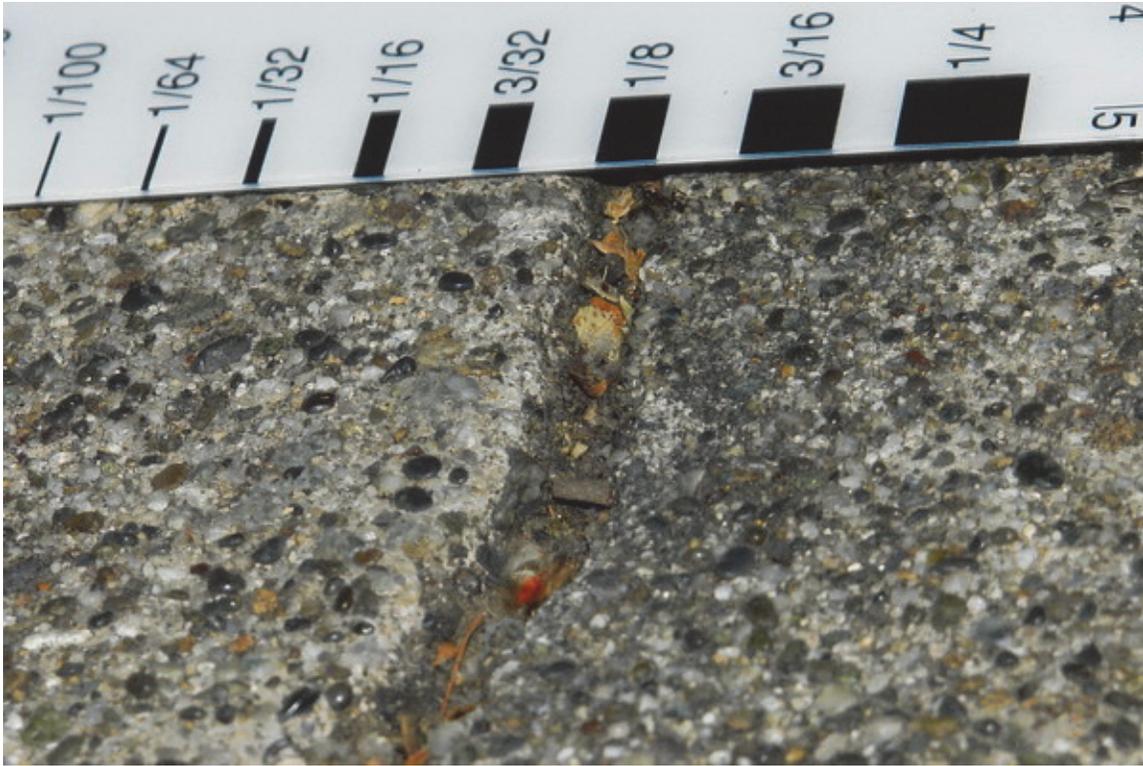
Older crack in concrete exhibiting worn and rounded edges (photo credit: Exponent).
